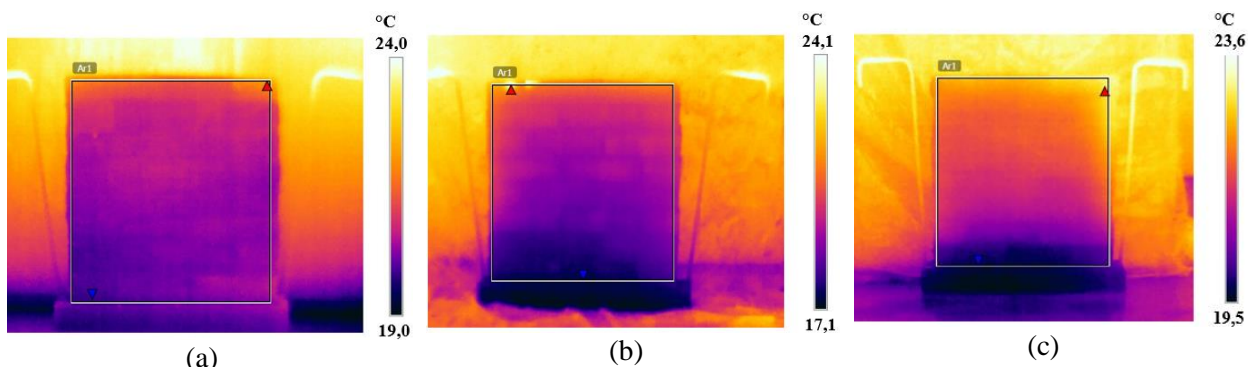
Sample PB2: a) dry wall; b) humid wall; and c) wall at 28 days
